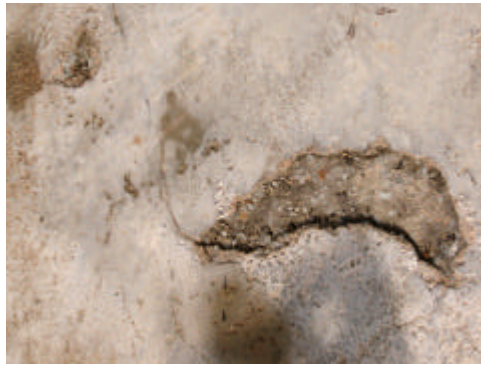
Spalling on top of a dolphin in front of mooring equipment.
